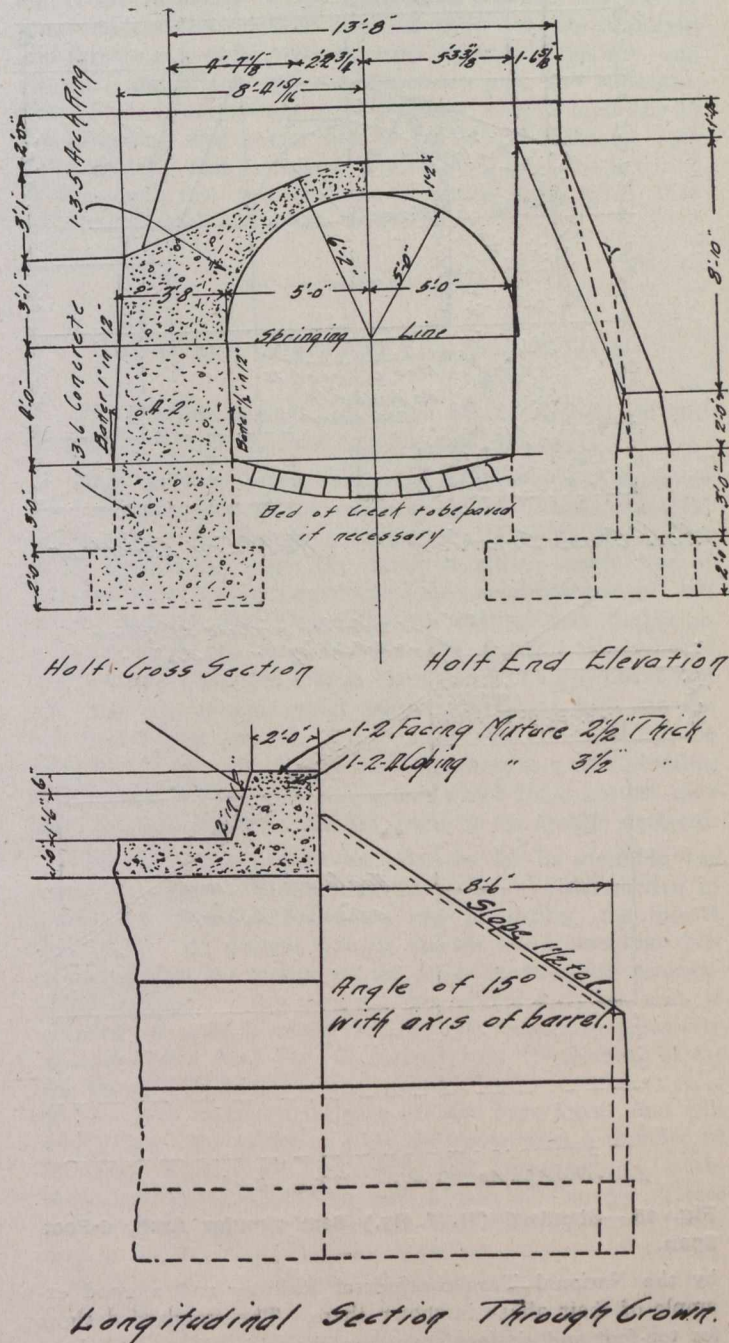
Standard (N. T. Ry.) Semi-circular Arch, 10-Foot Span.
